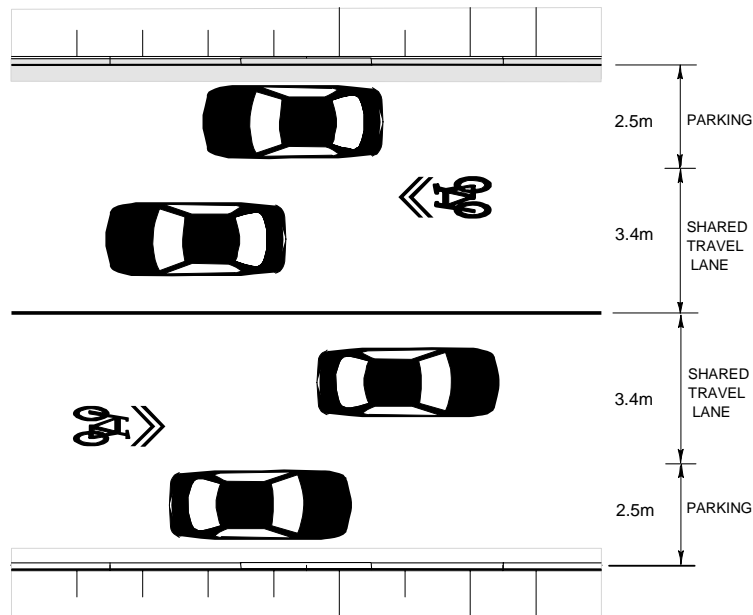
Dunbar Street Bike Lanes, W 41st Ave to SW Marine Drive - Typical Configuration
